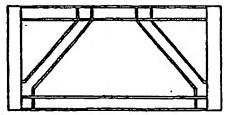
Bend-collapsible multi-storied earthquake-proof walls
